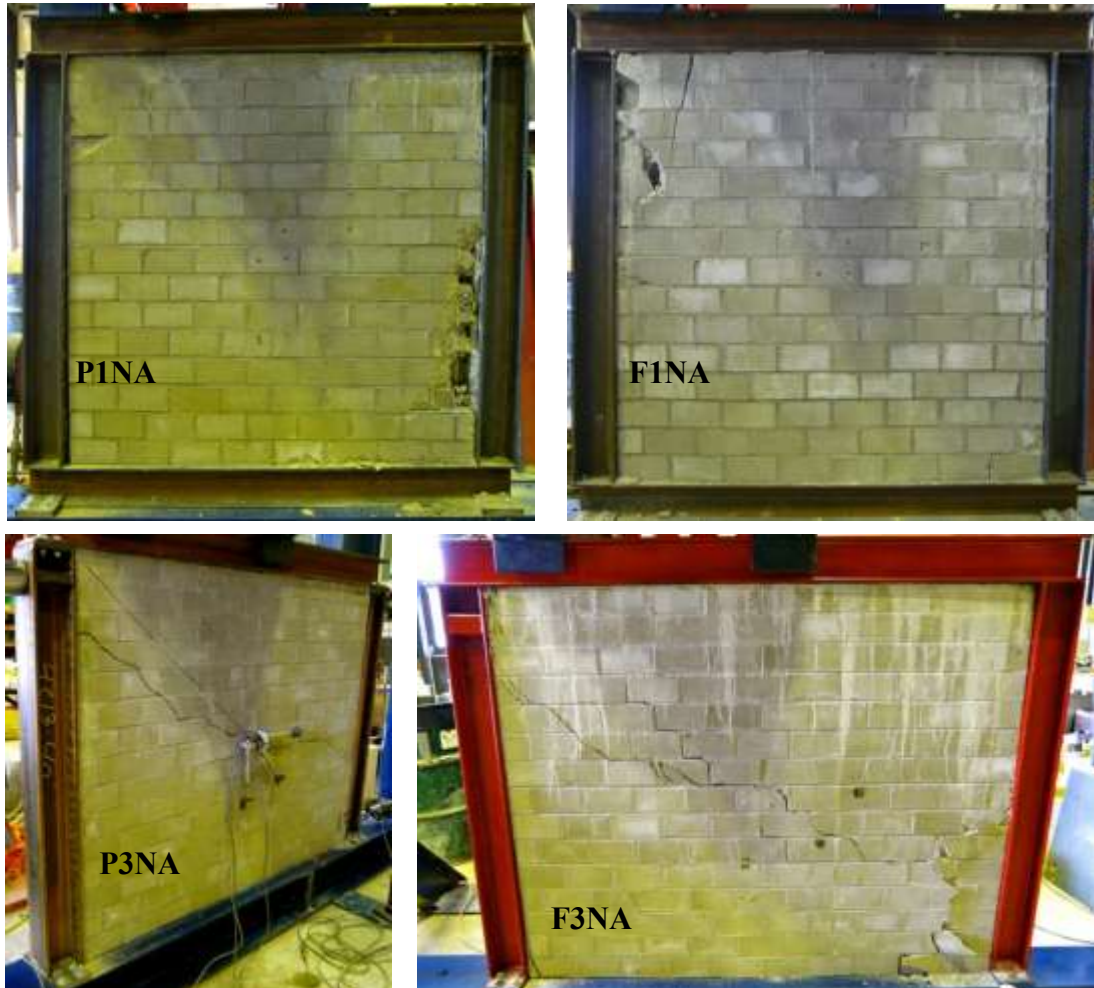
Failure modes of infill frame specimens of grouting situation
